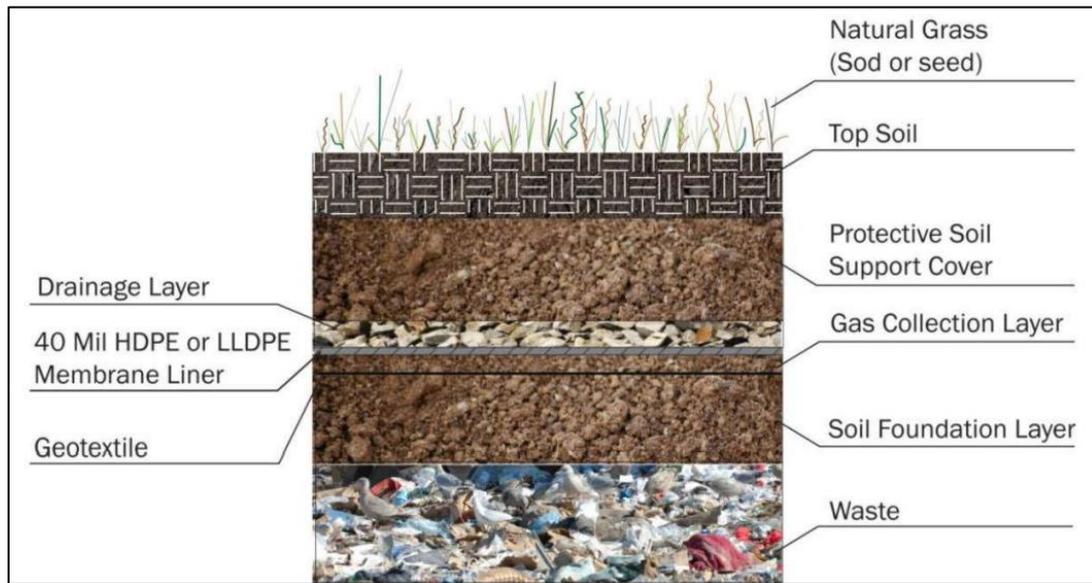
A detail of a traditional landfill cap used for MSW landfills. Source: www.scsengineers.com
